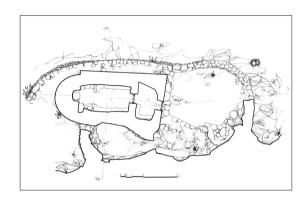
Saria. Plan and section of building type B'. Moutsopoulos (1978), p. 354
